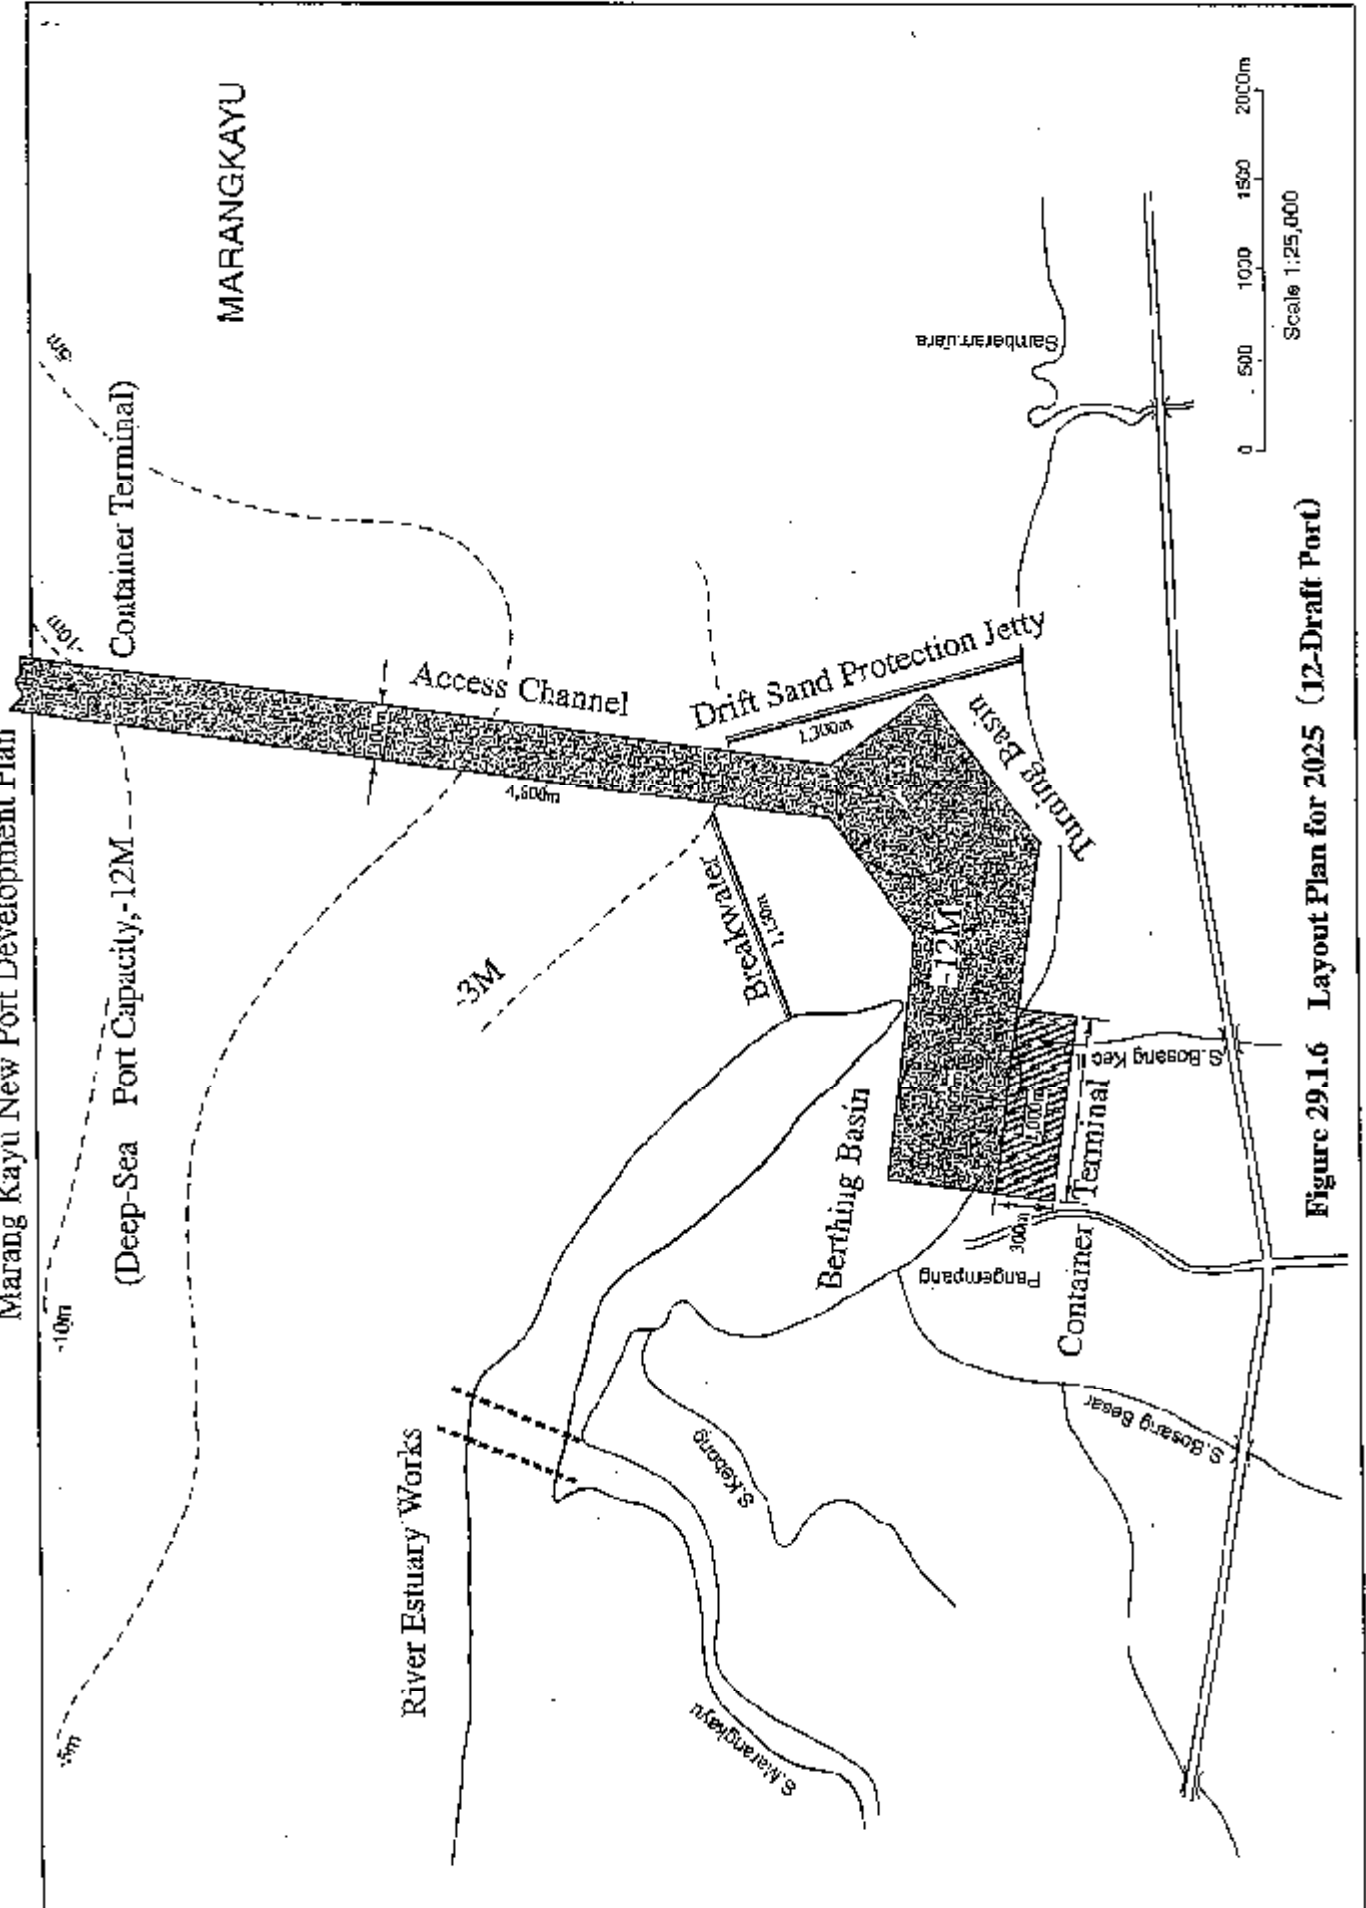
Layout Plan for 2025 (12-Draft Port)
